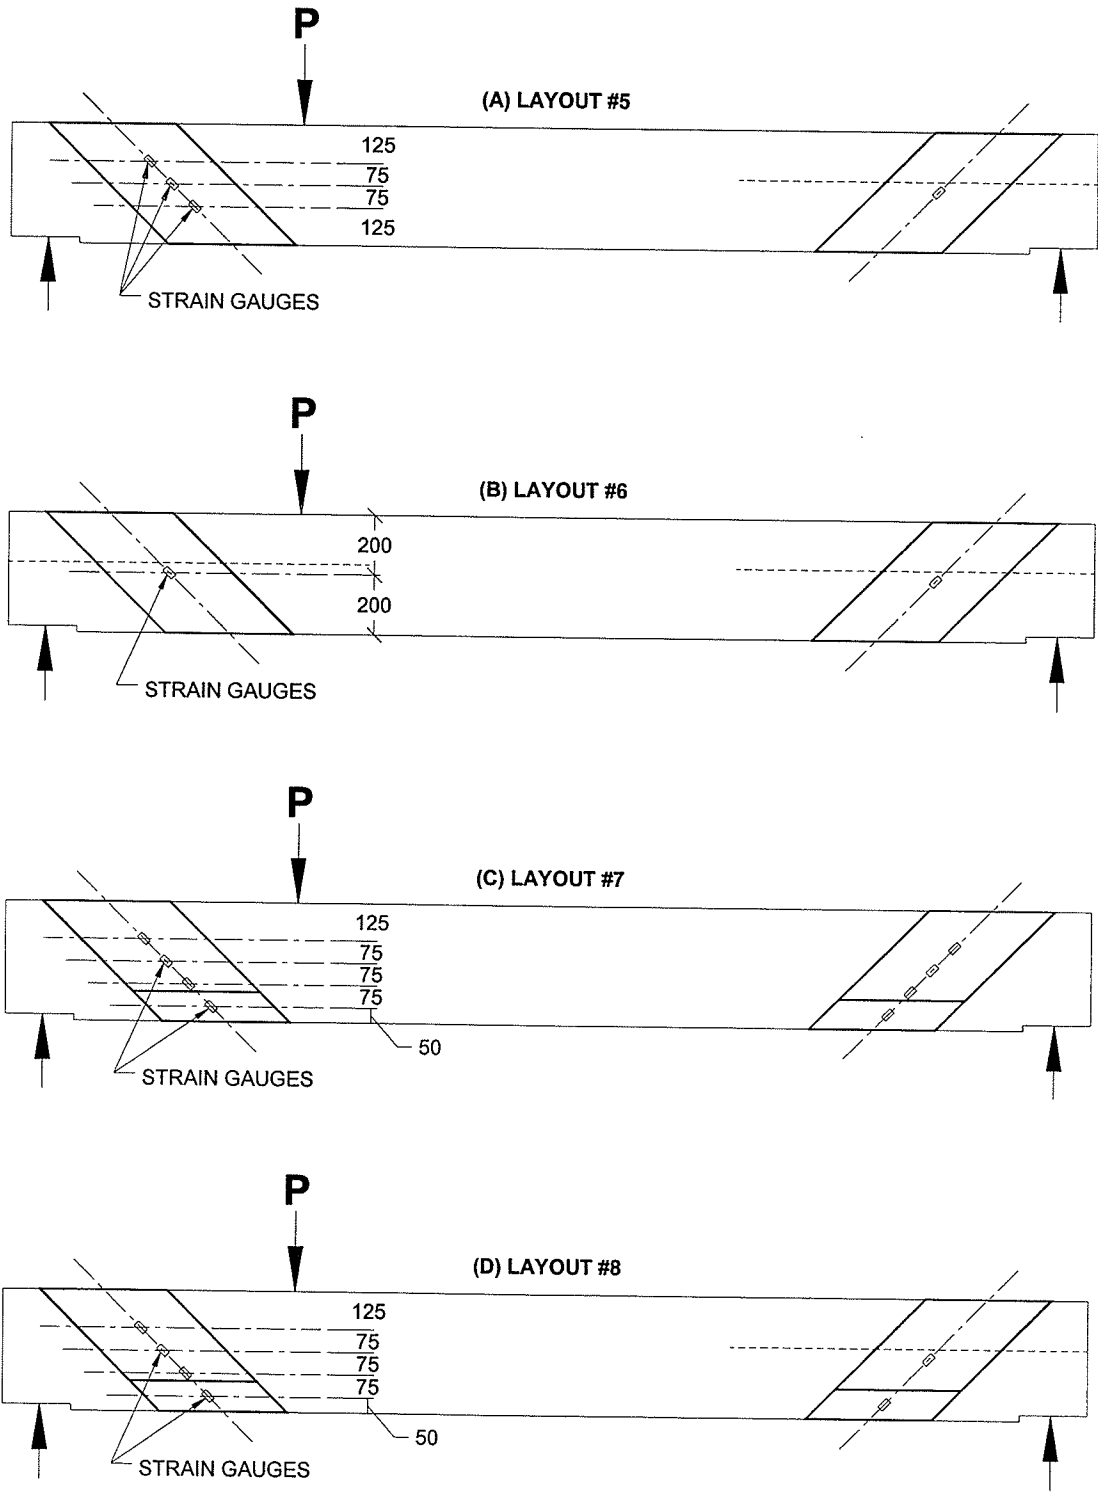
Diagonal sheet strain gauge layouts 5 to 8 (all dimensions in mm)
